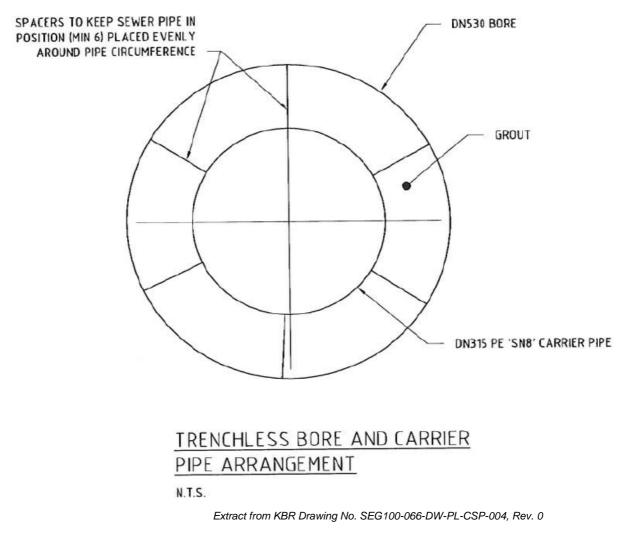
Detail of Horizontal Bore and 315 mm diameter sewer pipe
